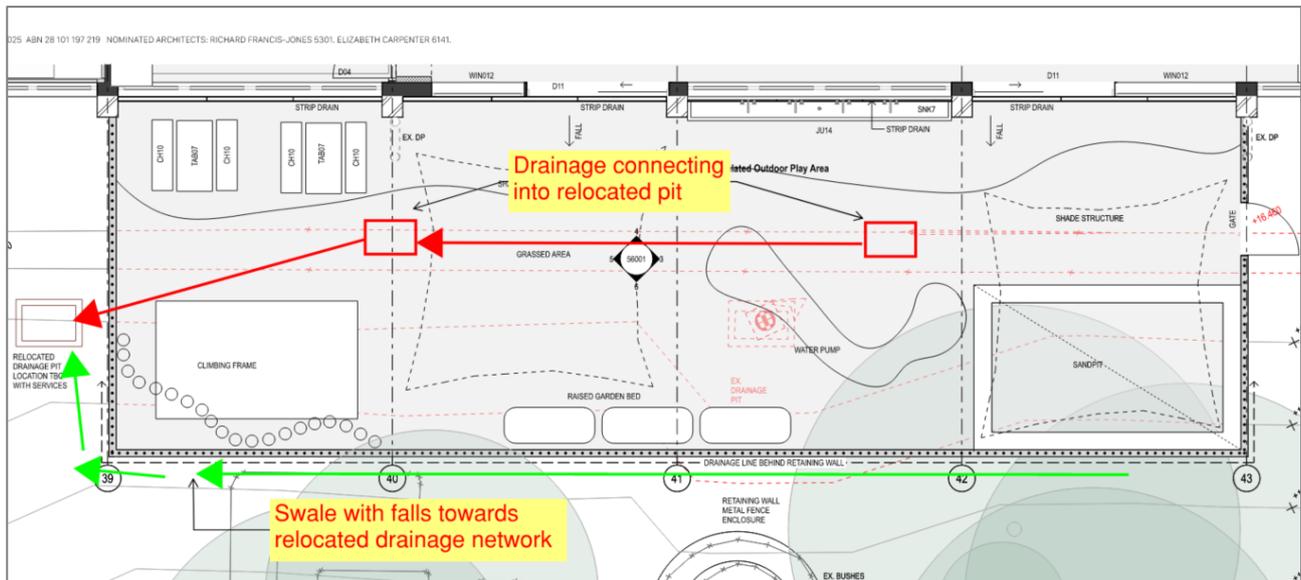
Proposed stormwater management at the proposed external play area south of Building C.
